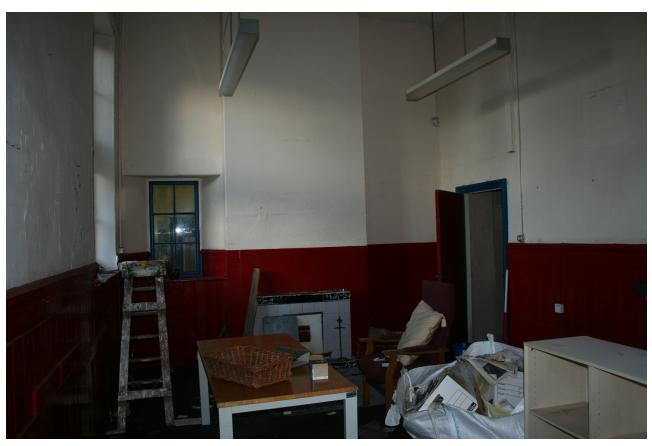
The original master's room, Area 10, looking south (frame PAH14087)
